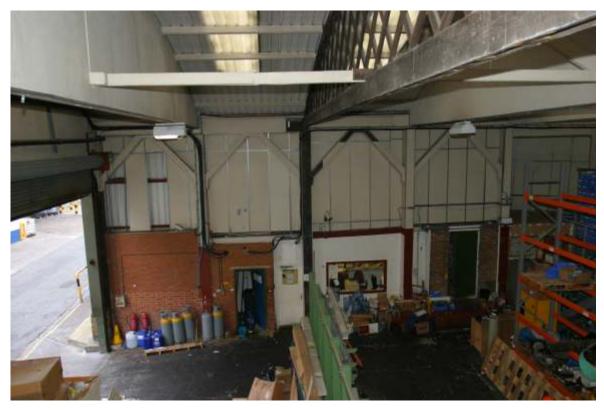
North side of Building 2 viewed from a south elevated position showing offices and messing facilities
